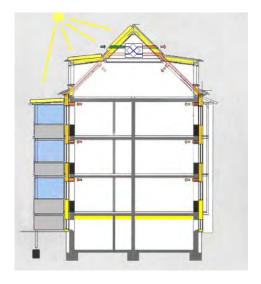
Prefabricated façade modules are used to construct a new building envelope around the building. This is physically optimal and does not reduce available space.
